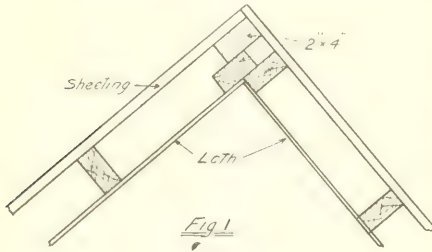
shows method of building up the corners of a frame house so as to provide firm support for lath. Fig. 2 shows method used for joining a partition to the wall.
